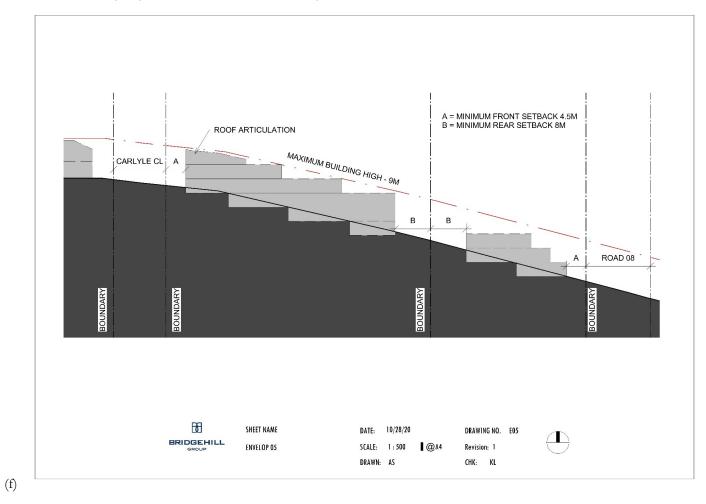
Section view of Building Height, excavation and floor level stepping and roof articulation controls
